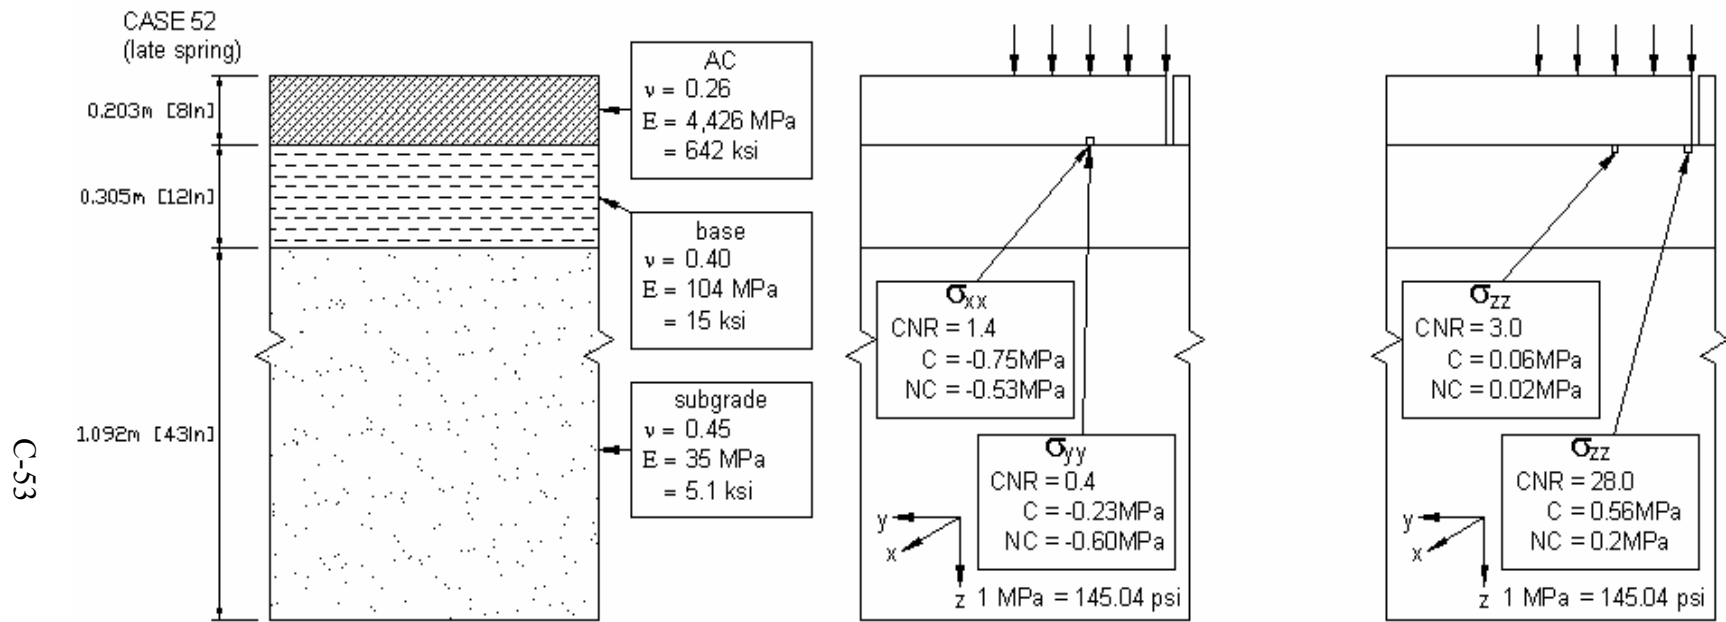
Summary cross section for case 52, (C – stress in cracked pavement, NC – stress in pavement with no crack, CNR – crack/no crack (stress) ratio)
